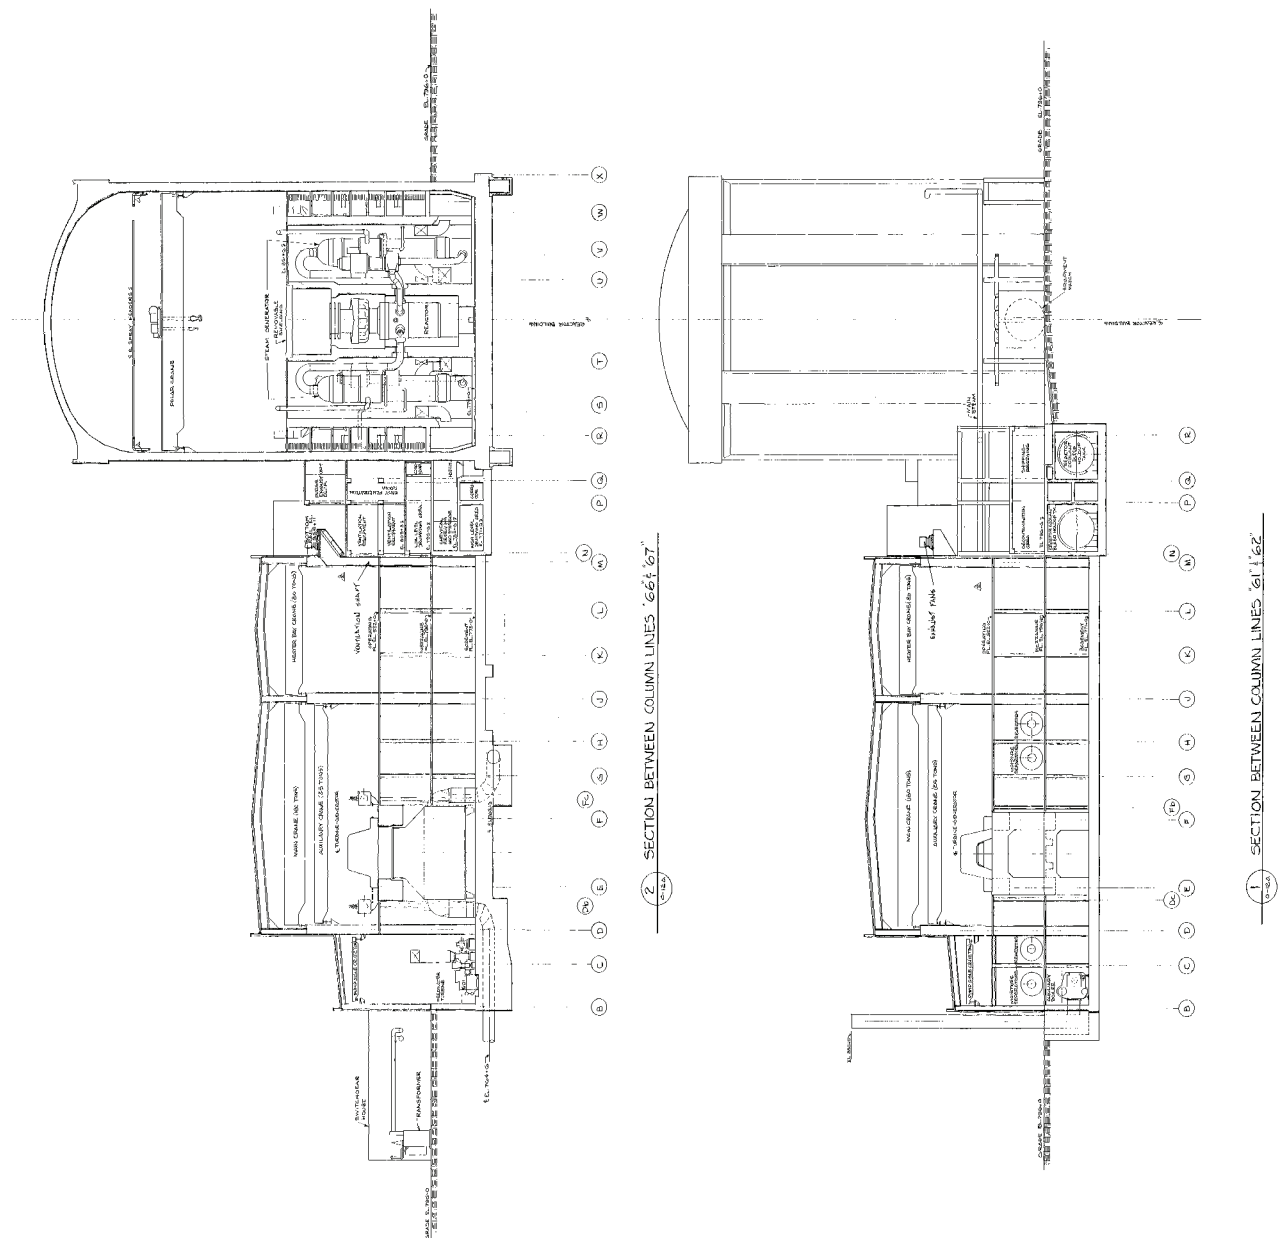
Architectural drawing, showing the elevation of reactor building 1 (SHPO Site No. 0148.02) and the Turbine Building (SHPO Site No.0148.01).
